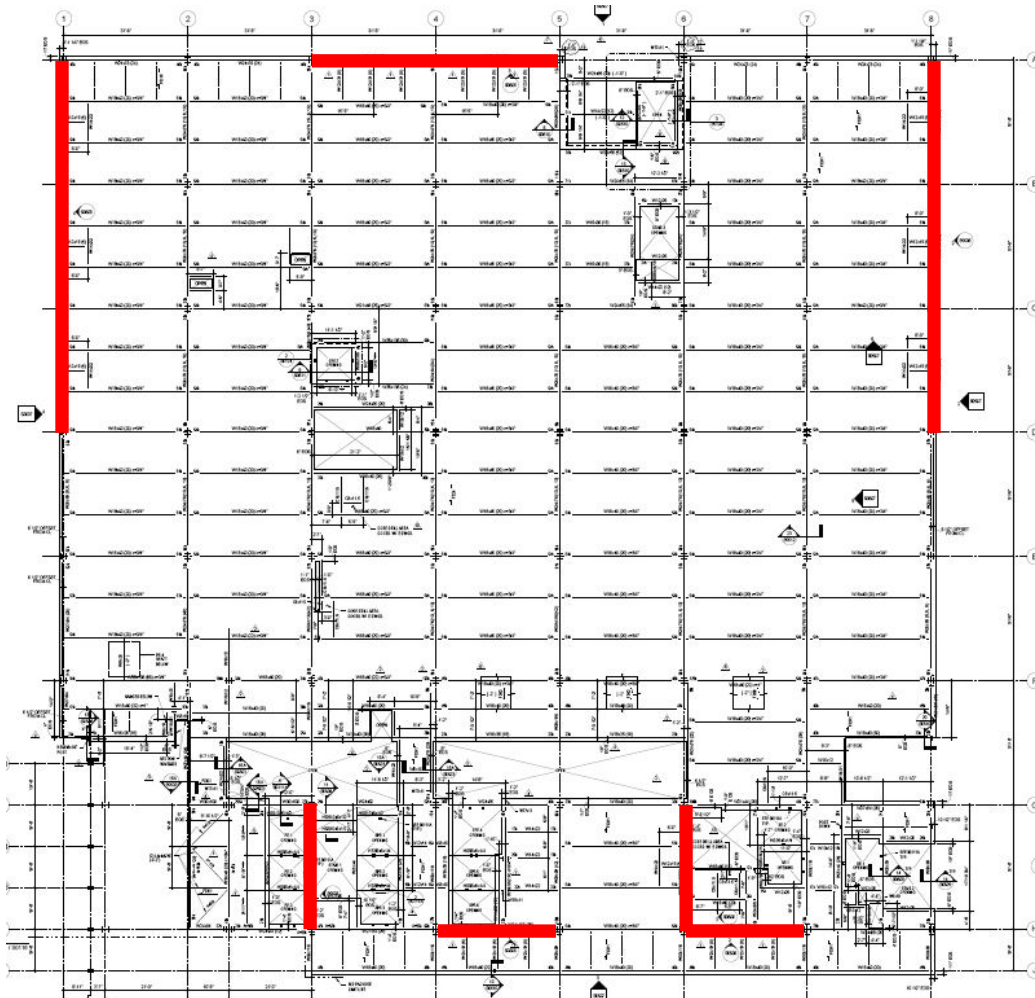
Figure B – Level Two Framing Plan with Braced Frames Highlighted
